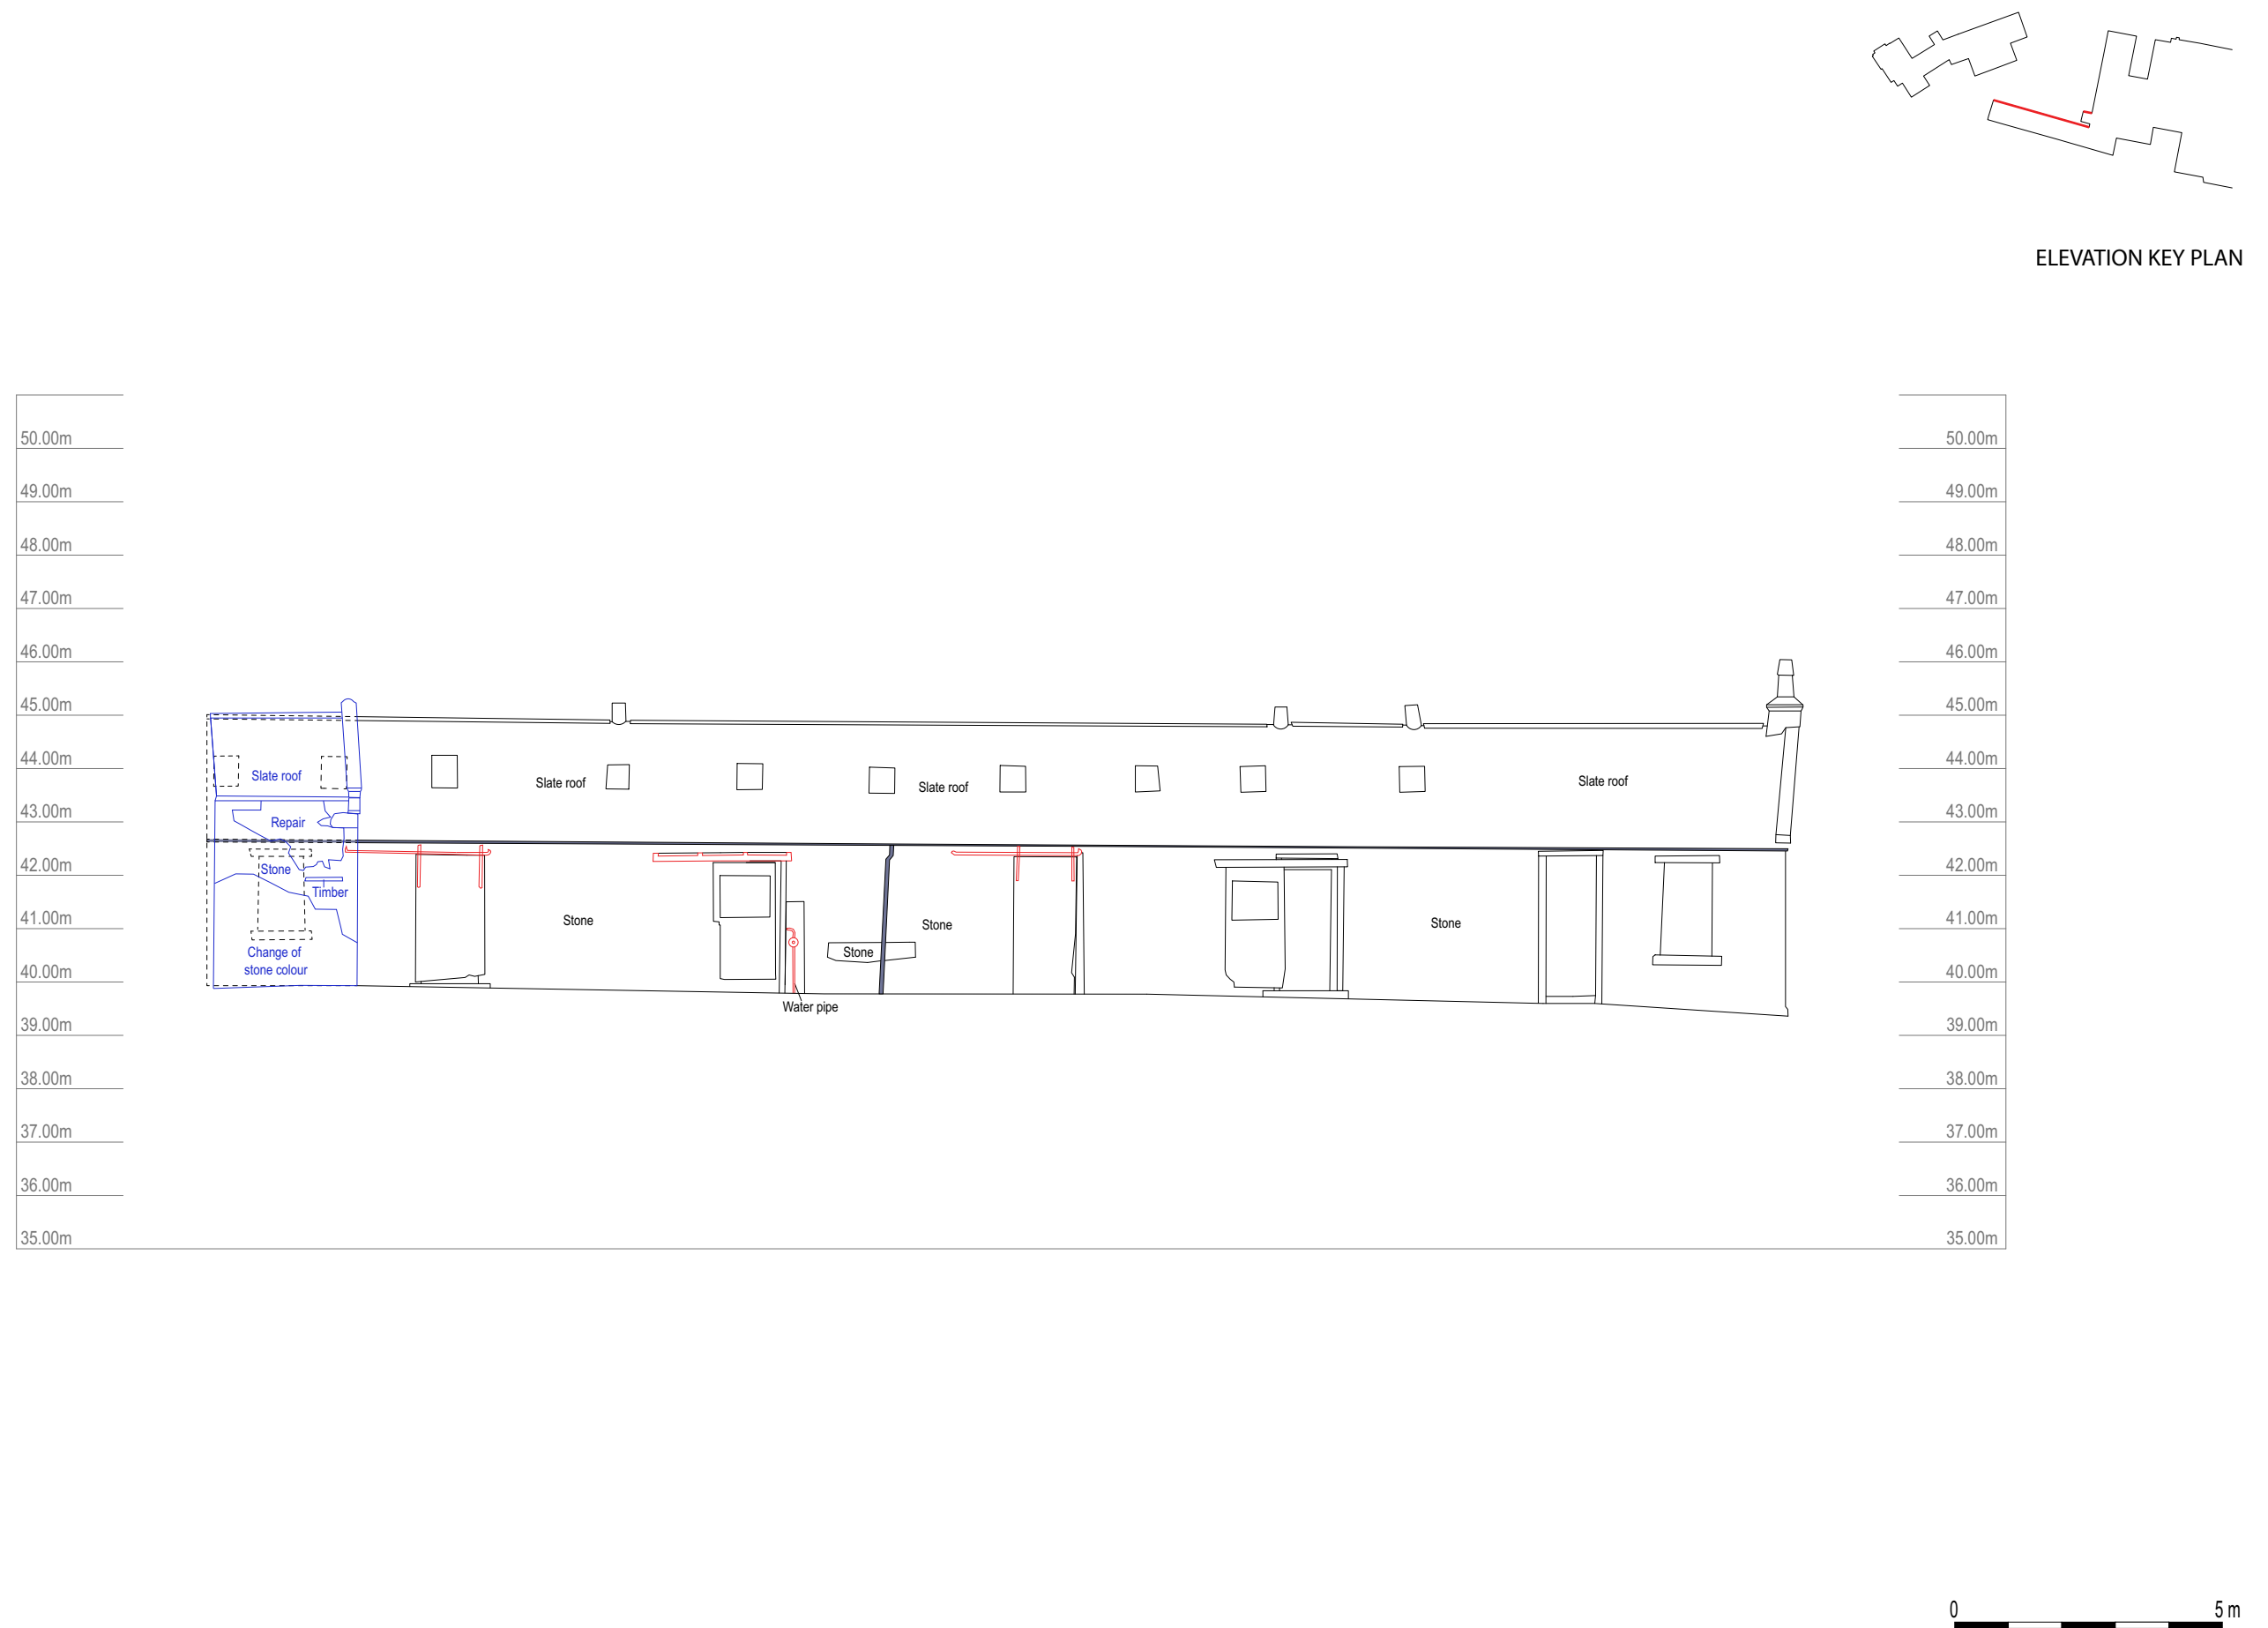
North facing elevation of the South barn & annexe showing elevations 2 & 4.
